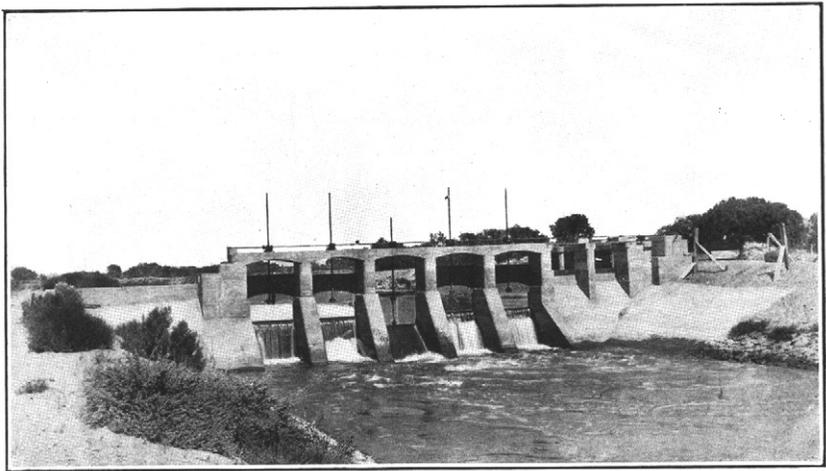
SHOWING SUBSTANTIAL MASONRY OF CANAL STRUCTURE.
